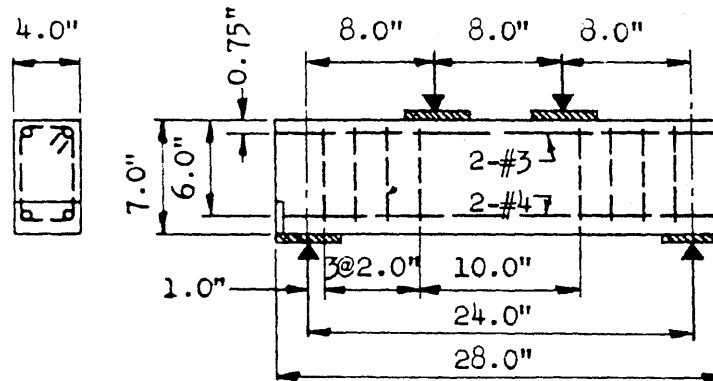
DETAILS AND DIMENSIONS OF TEST SPECIMENS
